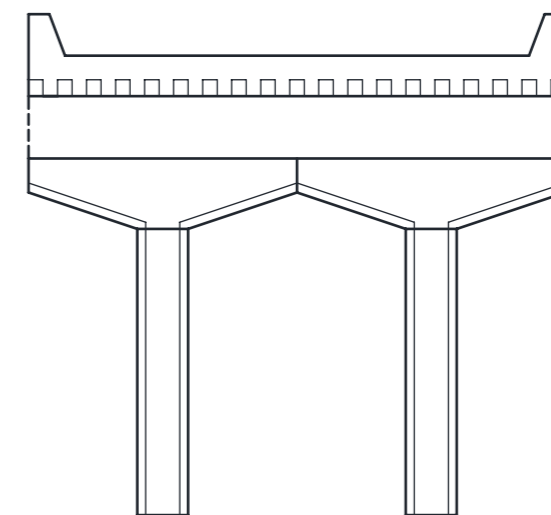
Above. Standard precast concrete bridge system. Using a 'post and beam' construction, it is limited to only a horizontal and vertical direction.
